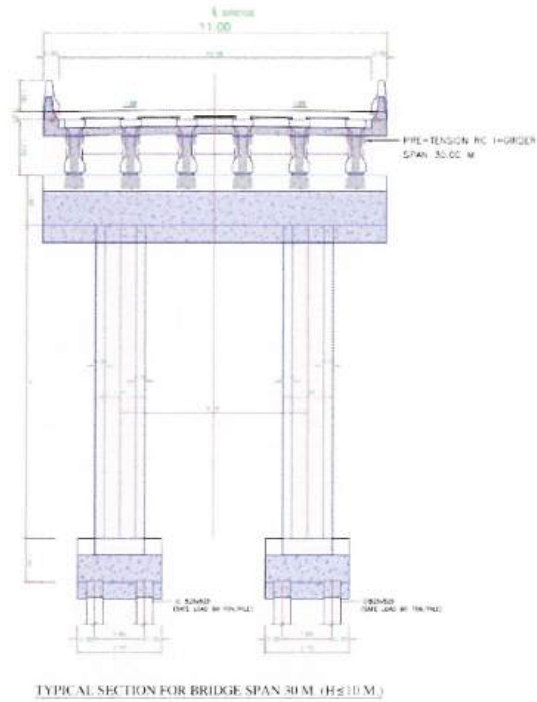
STRUCTURAL SCHEME PRECAST RC I-GIRDER 30M
